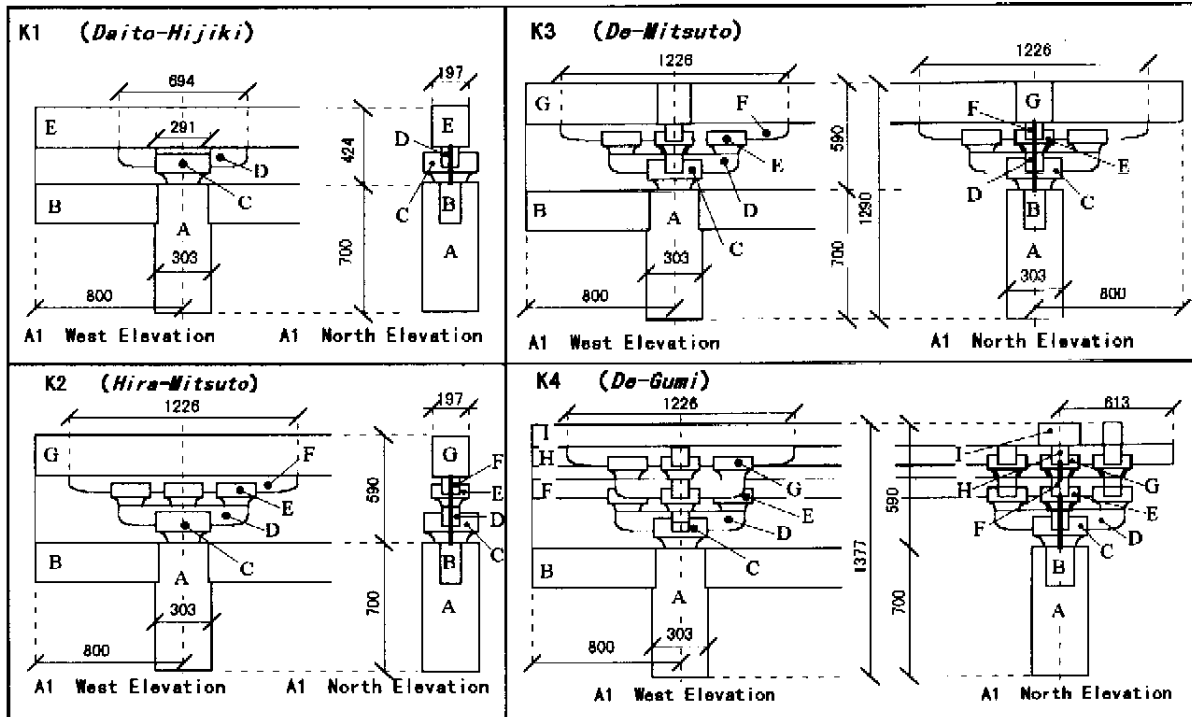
Elevation and Section of the 4 Specimens (mm)
